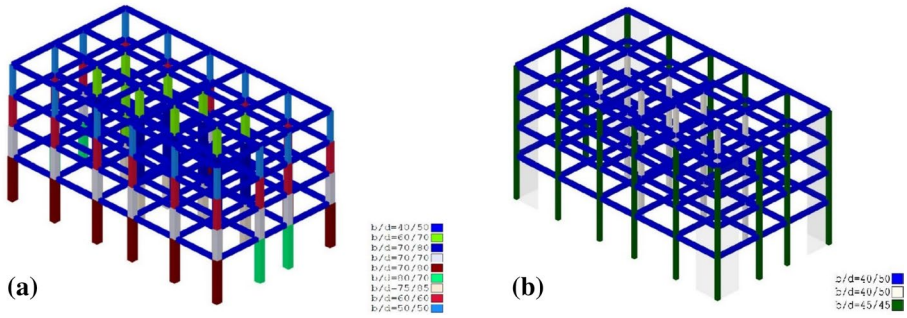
Low-rise building models with dimensions of frame elements [cm]. a Low-rise irregular frame structure with shear-wall (LRI-FS); b low-rise irregular frame structure with shear walls (LRI-FS-SW)
